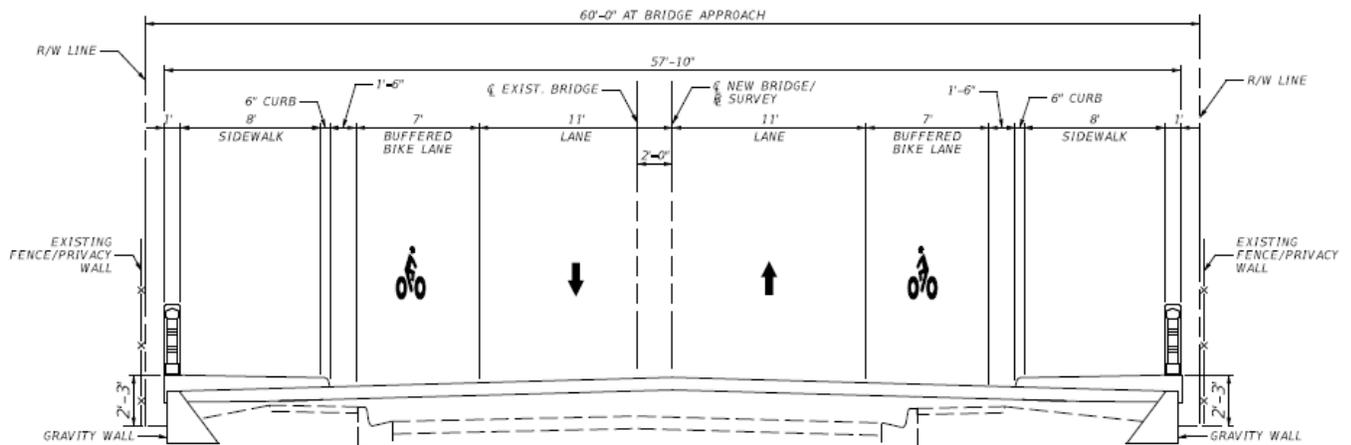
Replacement Alternative 7: Raised Bridge Profile
